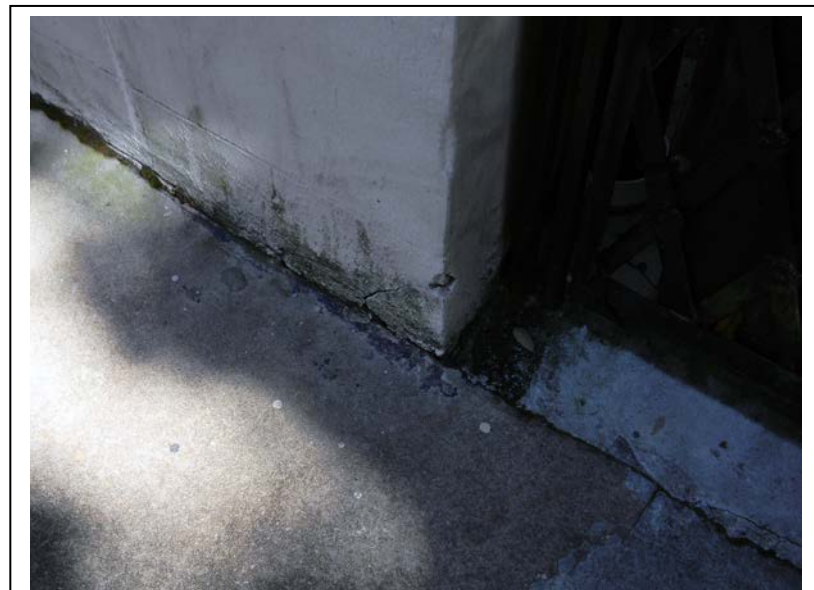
Signs of cracking and biogrowth on the foundation of the Dubose Heyward House on Church Street in Charleston. Photo by author.
